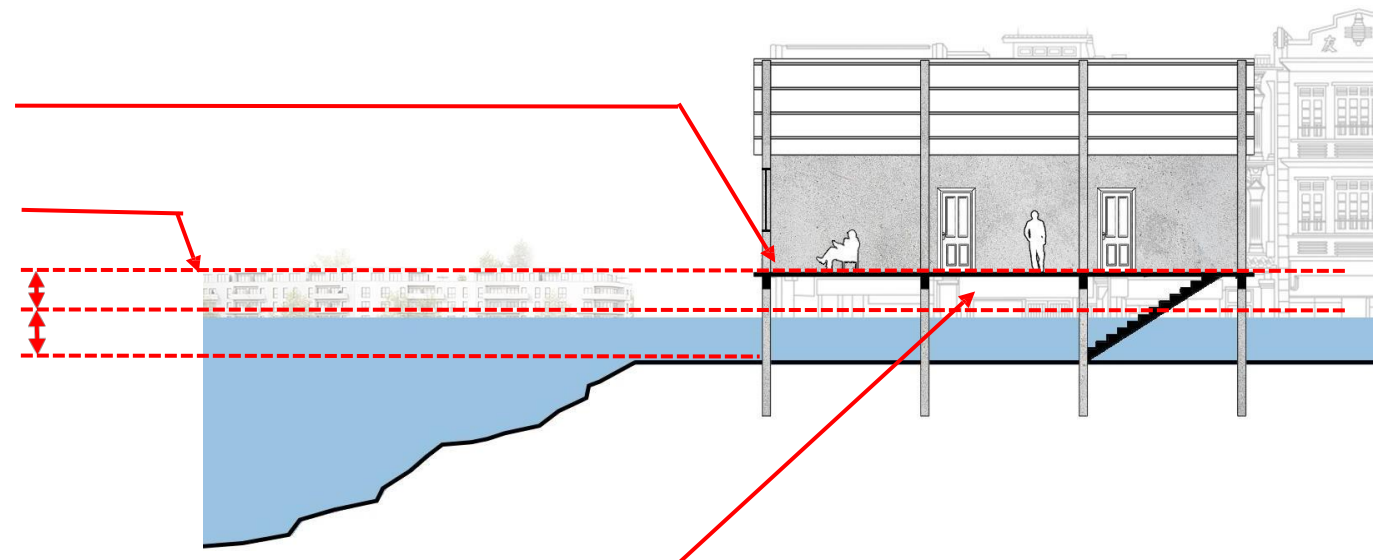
Stilted Foundation adapt with flooding when water level rises
